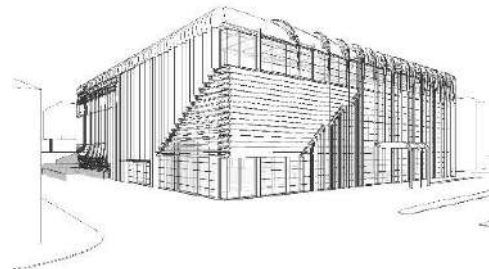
Vertical fins on east façade and horizontal fins on south façade (*Personal Rendering*)
